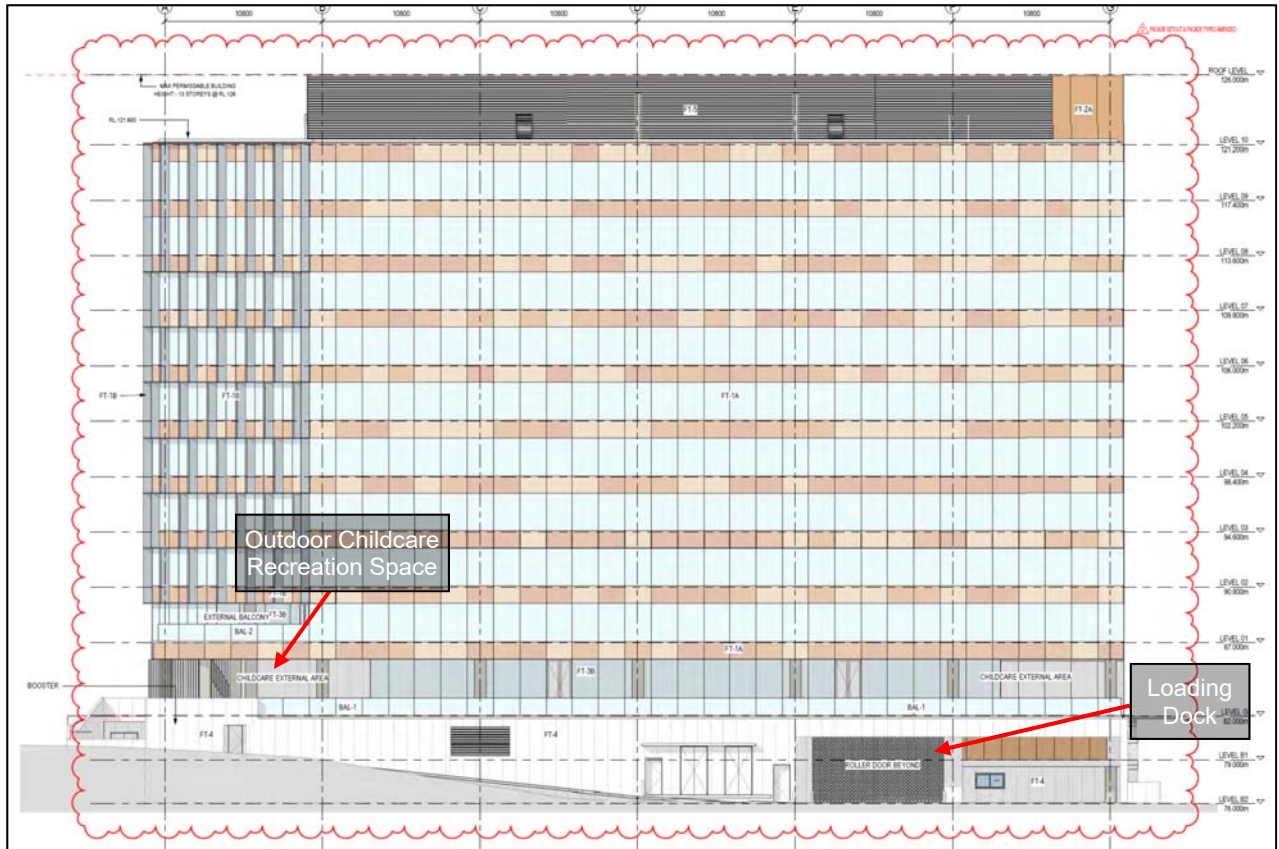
Southern Elevation (source: Rts – BVN Architects)
